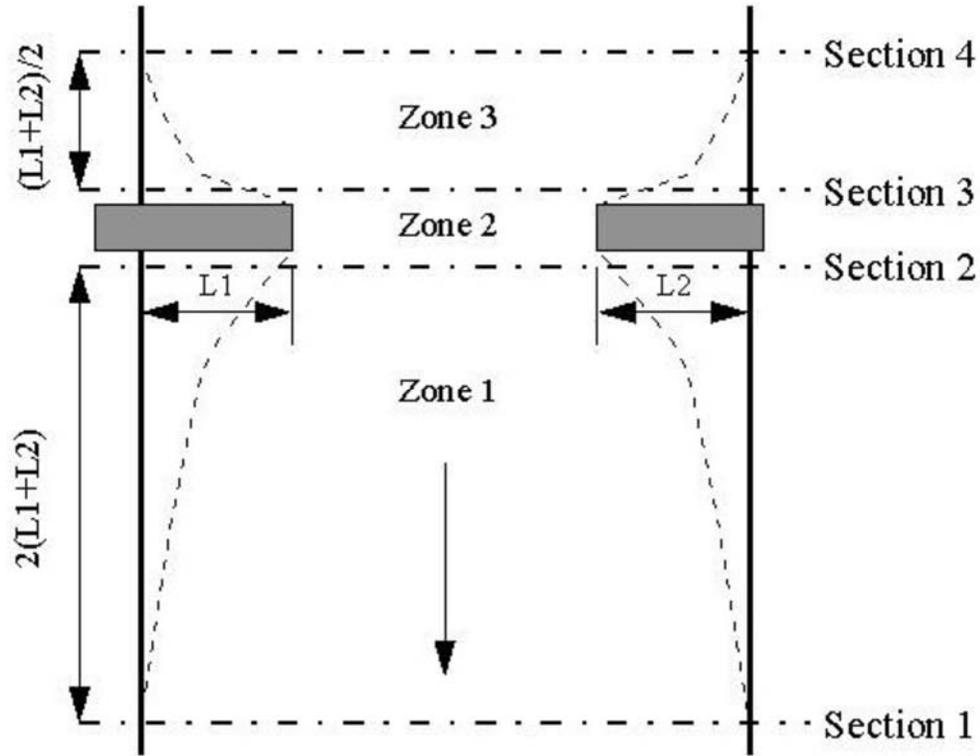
Cross Section Locations at Bridge or Culvert
